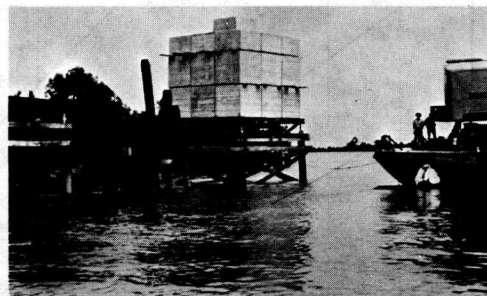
Load of 234 tons on 20-in. tubular pile—south bank of Saigon River.
